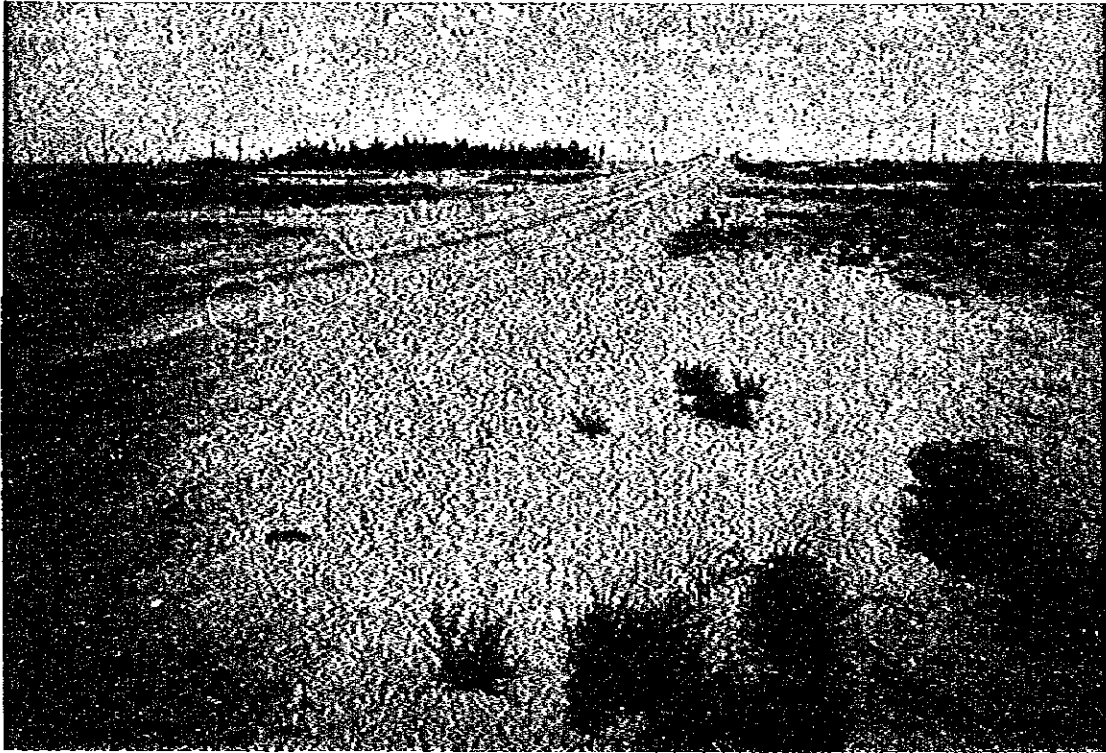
Republican Road (Atyrau to Mahambet; Flooded Area)
